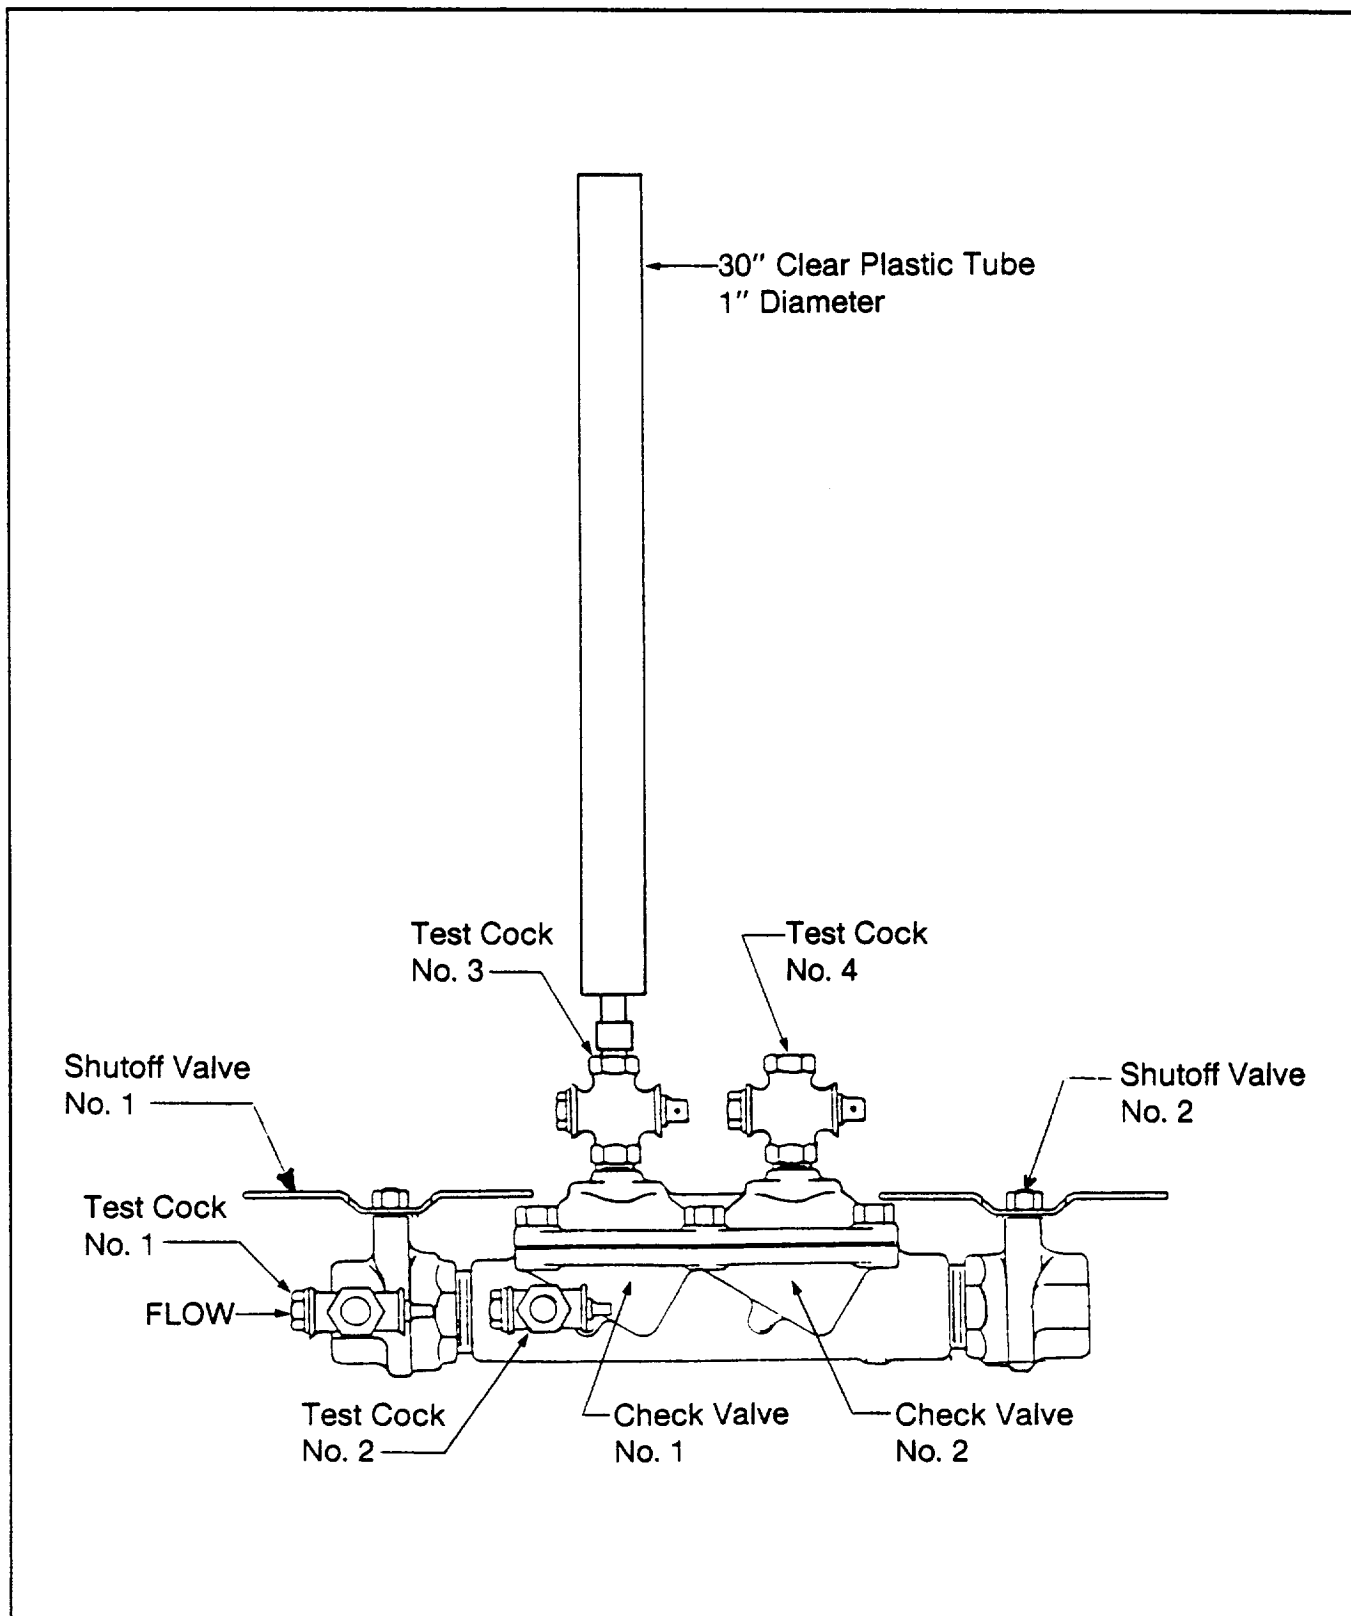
Setup For Testing Double Check Valve Assembly Using Sight Tube.
